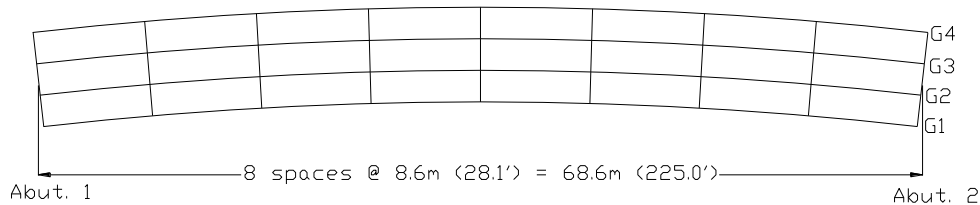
Stage 2 of Construction for Paired Girder (Inner Girders Placed First) Erection of Single-Span, 4-Girder, 305-m (1000-ft) Radius Bridge.
